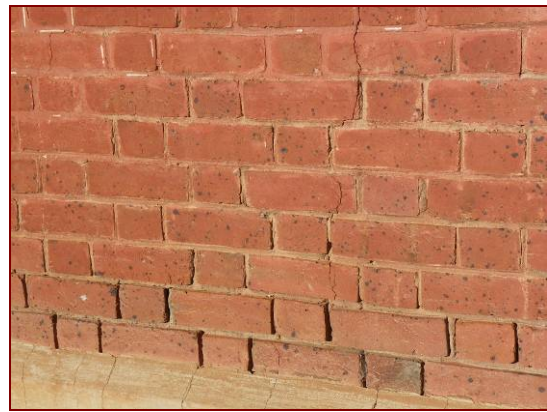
Failed mortar (missing) and cracks – north elevation.
